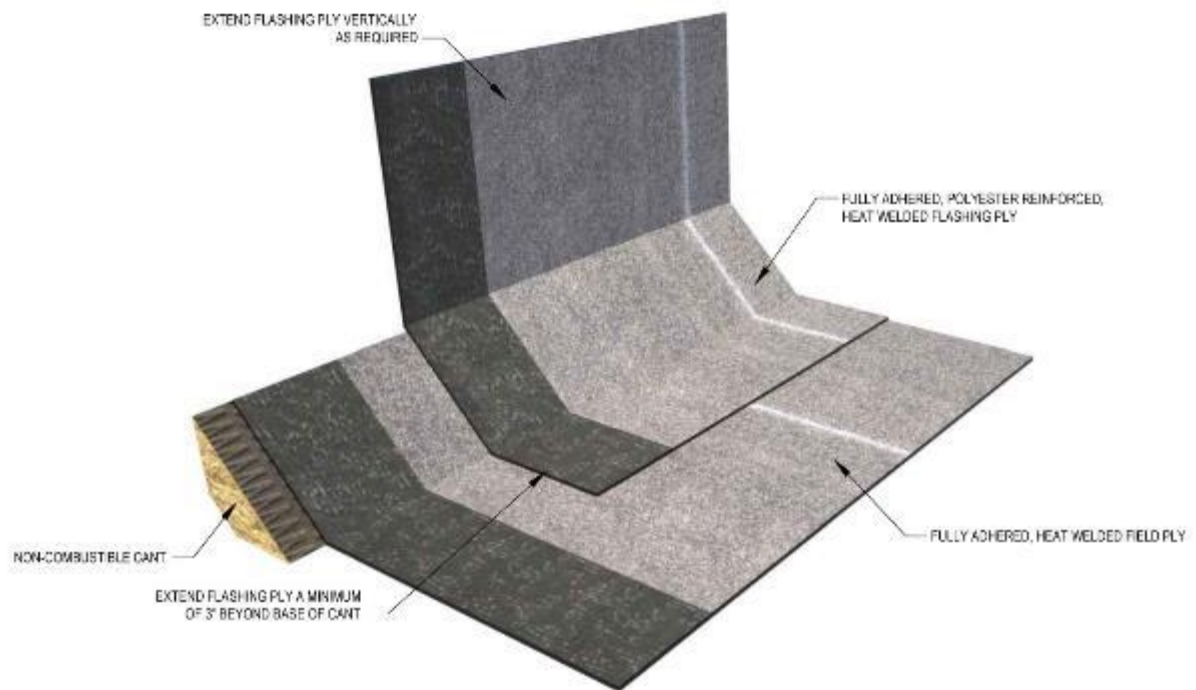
Fully Adhered, Heat Welded Vapor Retarder Flashing at Wall/Curb With Cant
